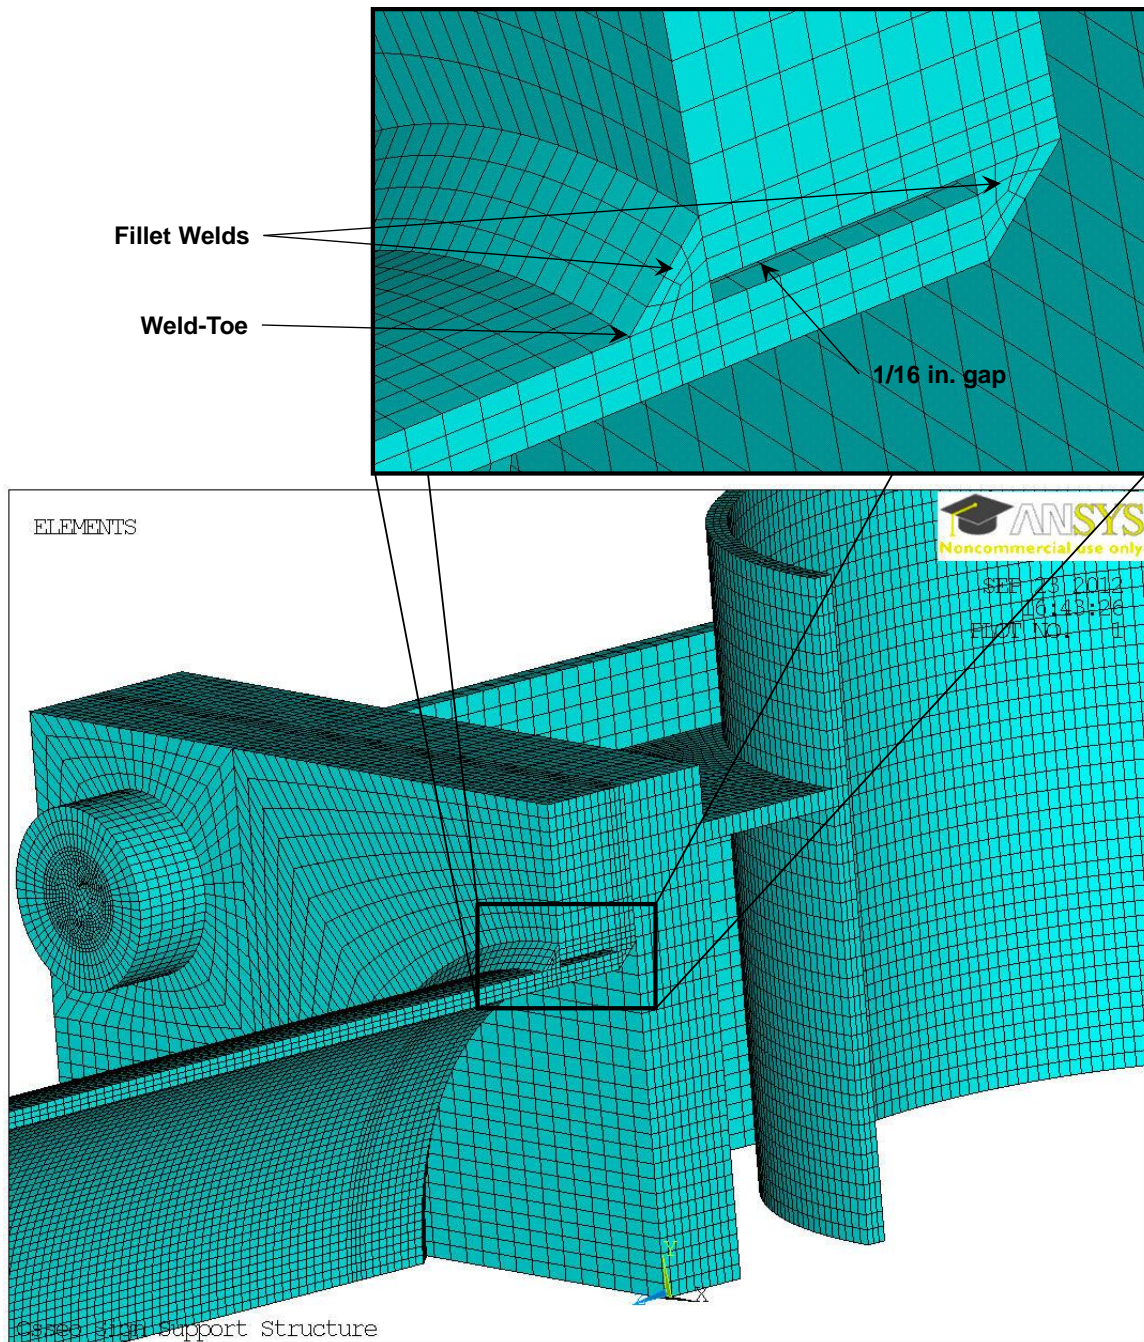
Osseo structures – up-close view of high-fidelity connection geometry and mesh illustrating fillet welds, weld-toe and 1/16 in. gap.
